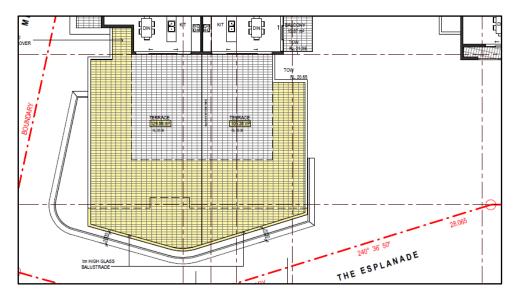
| Original proposed modifications to Level 5 (Source: Applicant's Application)
